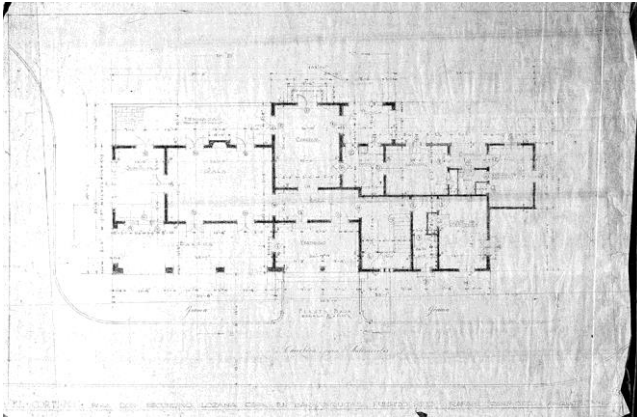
El Cortijo first floor plan, Rafael Carmoega Architect, circa 1939.
